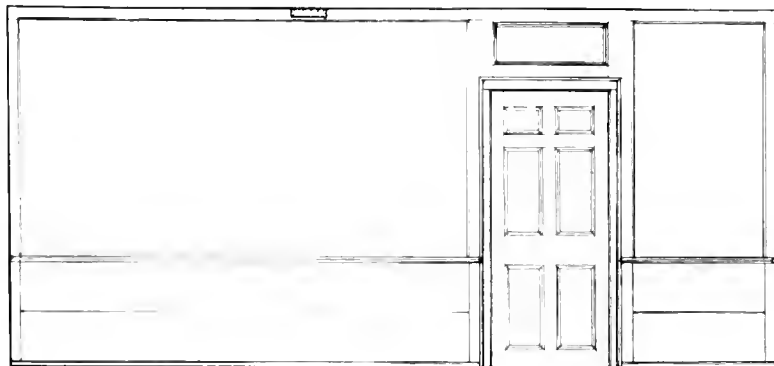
Living Room East Elevation. This wall is constructed with horizontal beaded board wainscoting and plastered above. Notice the summer beam interrupting the flat cornice at the ceiling. The door leads into the library.
